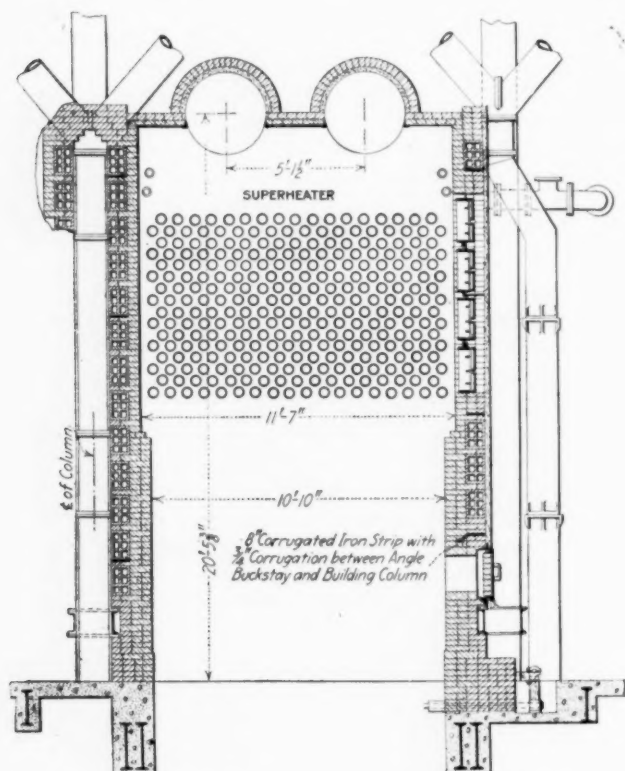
WALL CONSTRUCTION OF BOILER SETTING
